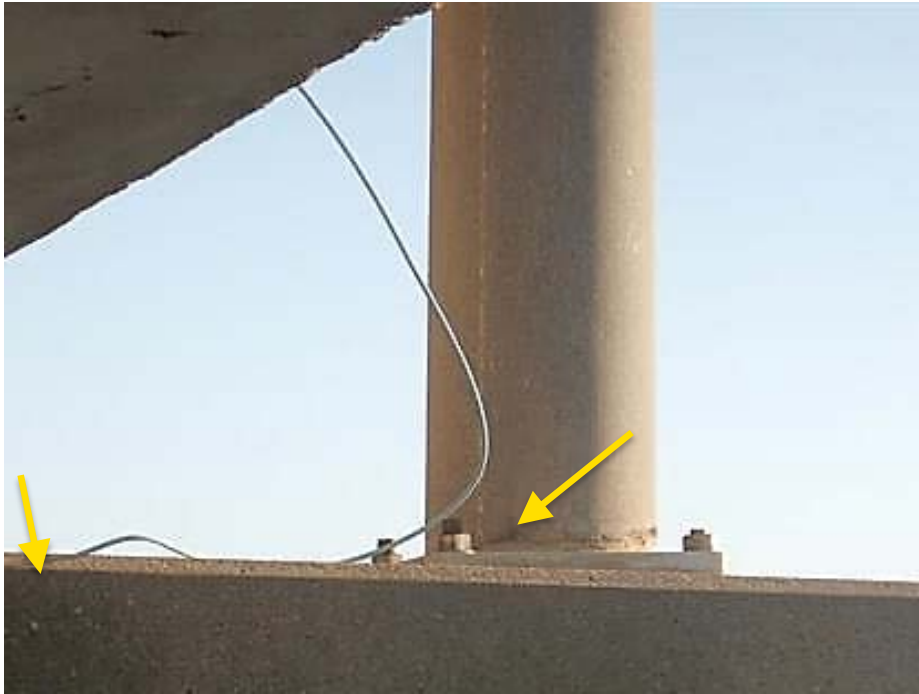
BSB105 Light Pole – Vertical Cracking Near Baseplate and Disconnected Cable (Looking Northeast)
